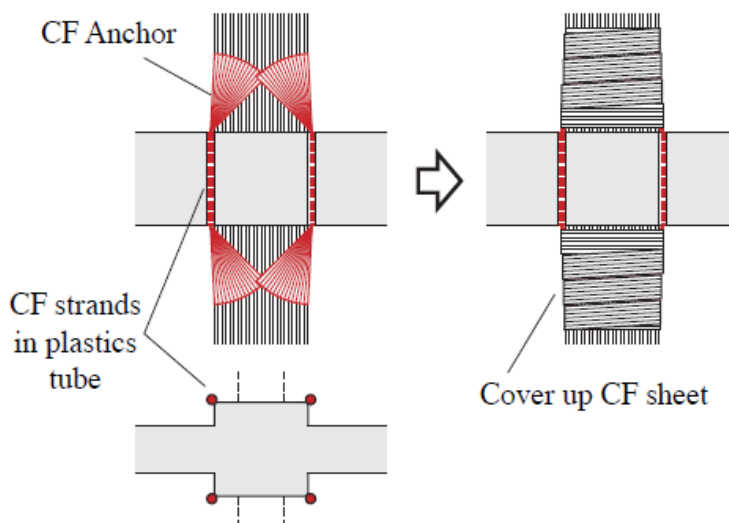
CFRP anchors in plastic tubes to strengthen interior joints (Shiohara et al, 2009).
